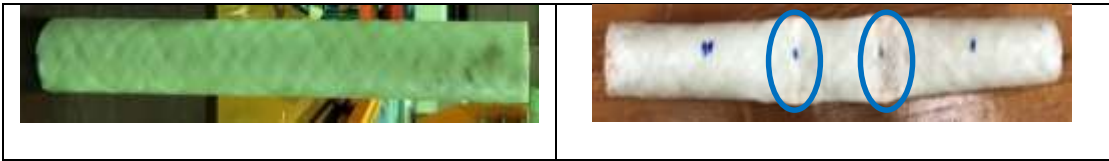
Overwrapped GFRP composite 50mm PVC plastic pipe under a four-point bending test. (a) undeformed pipe (b) deformed pipe with matrix cracking on the load contact point.
